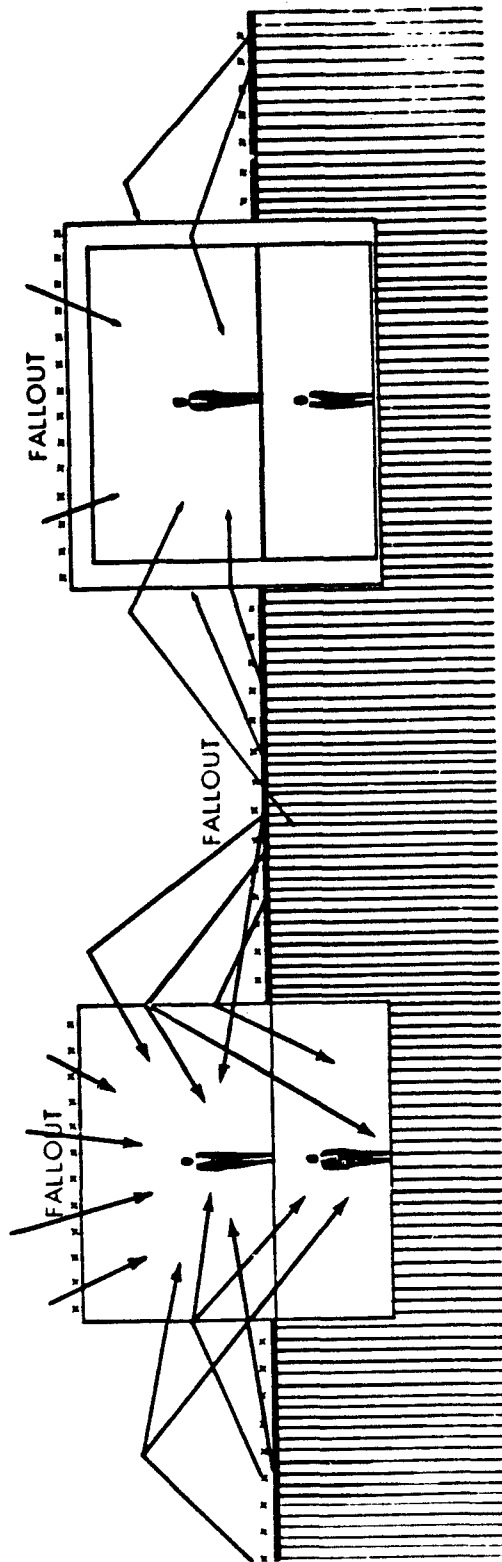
Basic Principles of Fallout Protection in New Construction⁹³
